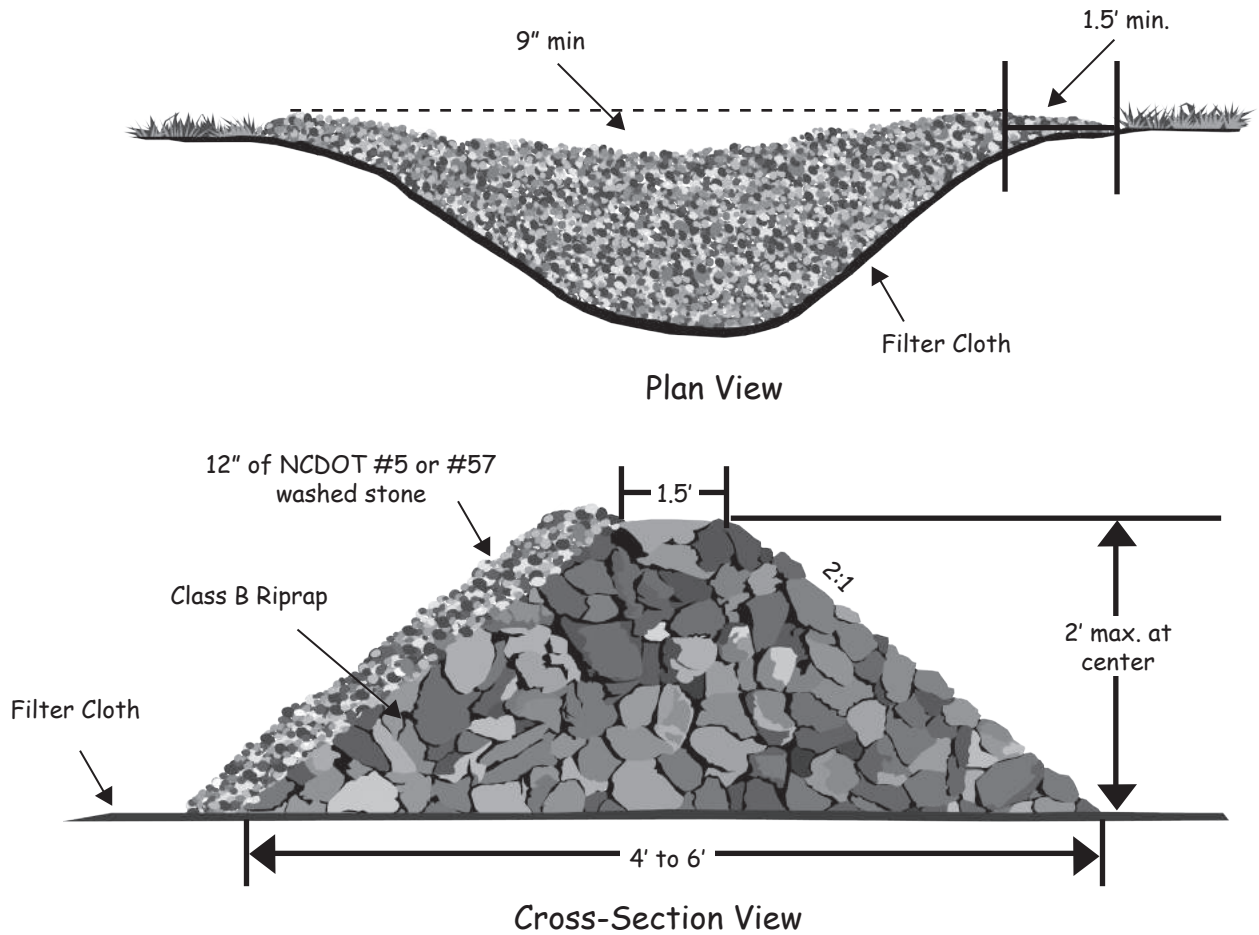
Stone check dam stone should be placed over the channel banks to keep water from cutting around the dam.
